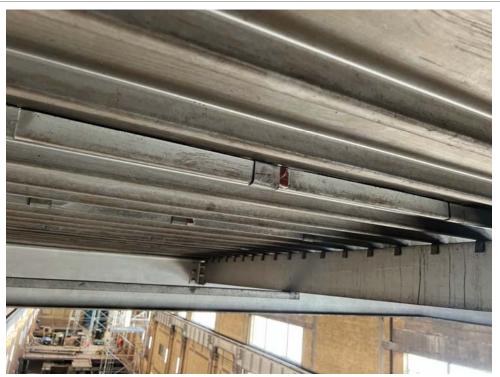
Roof – Deck connector potentially loose. Affects roof diaphragm to carry lateral loads.
